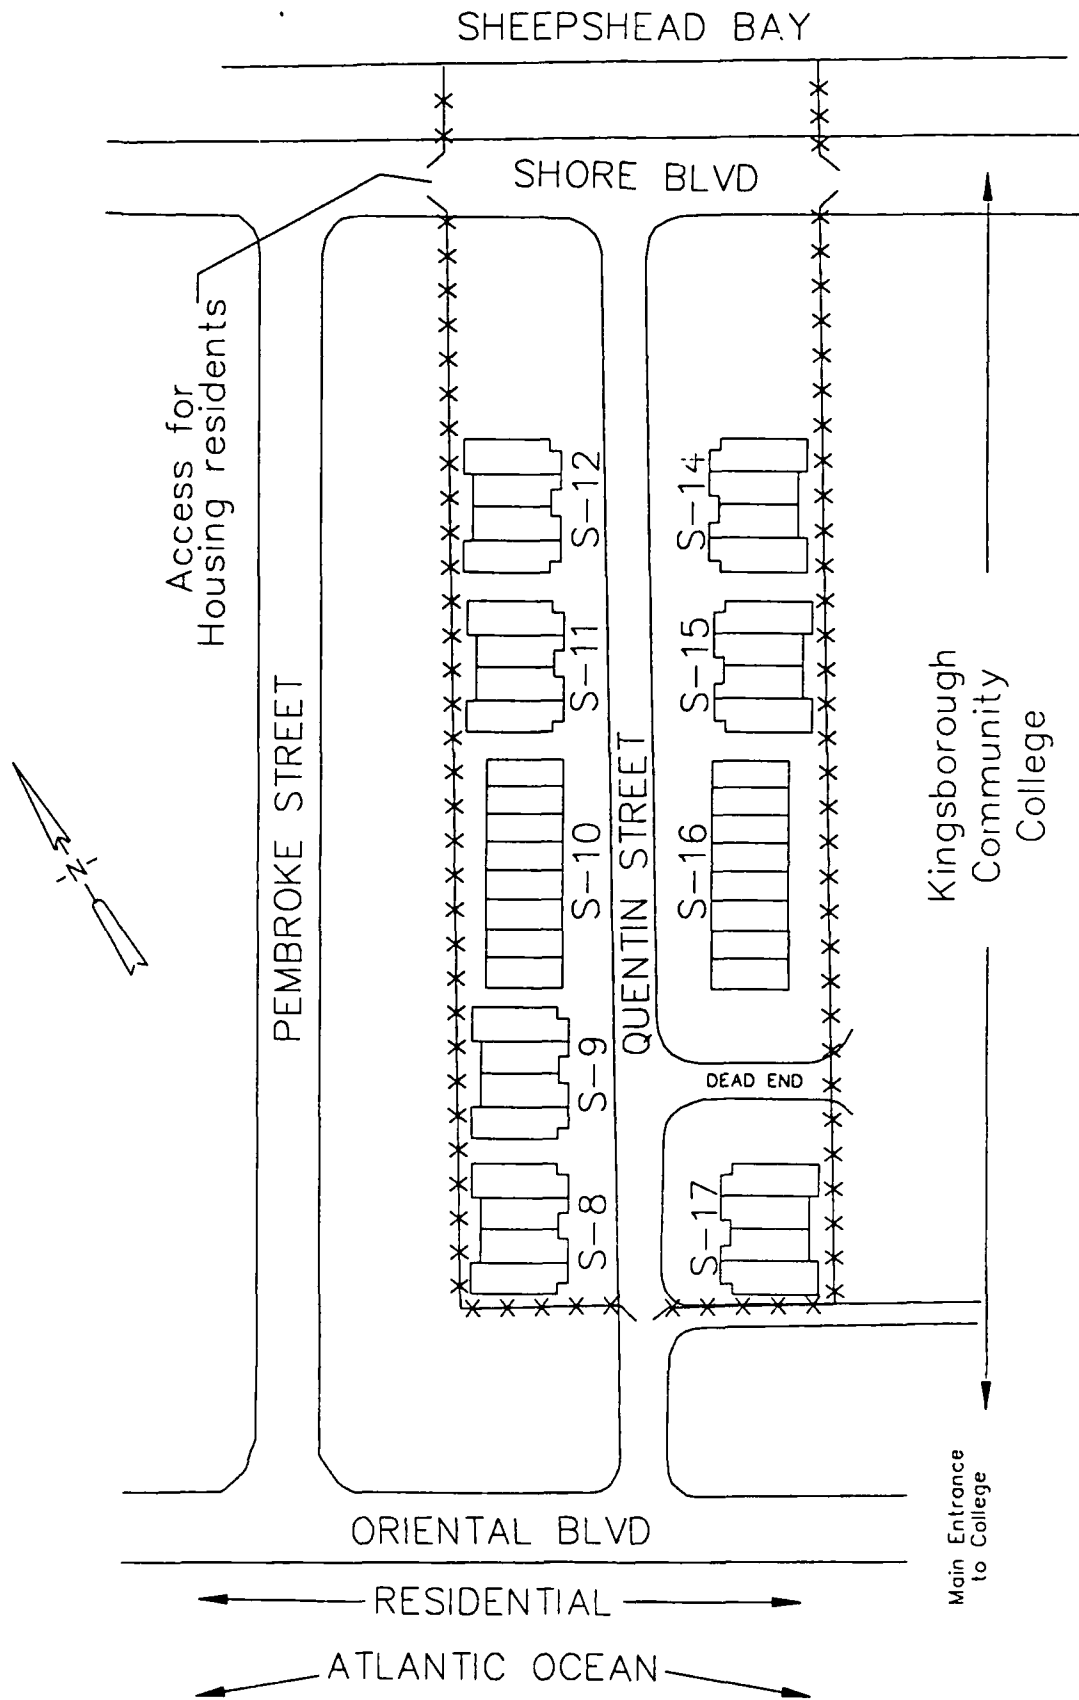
Site Plan Map of Manhattan Beach Army Housing Units
